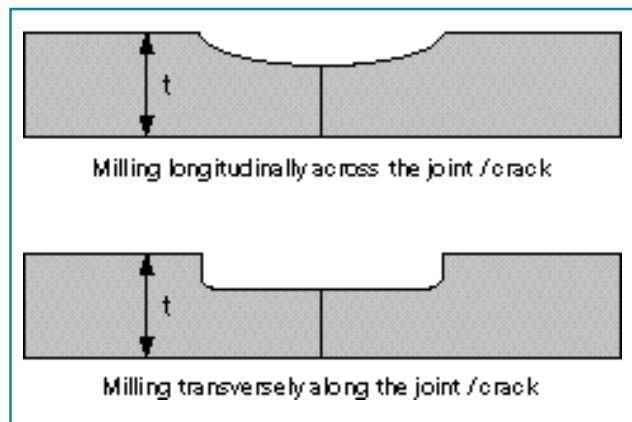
Profile of a partial-depth repair using milling equipment in removal.
